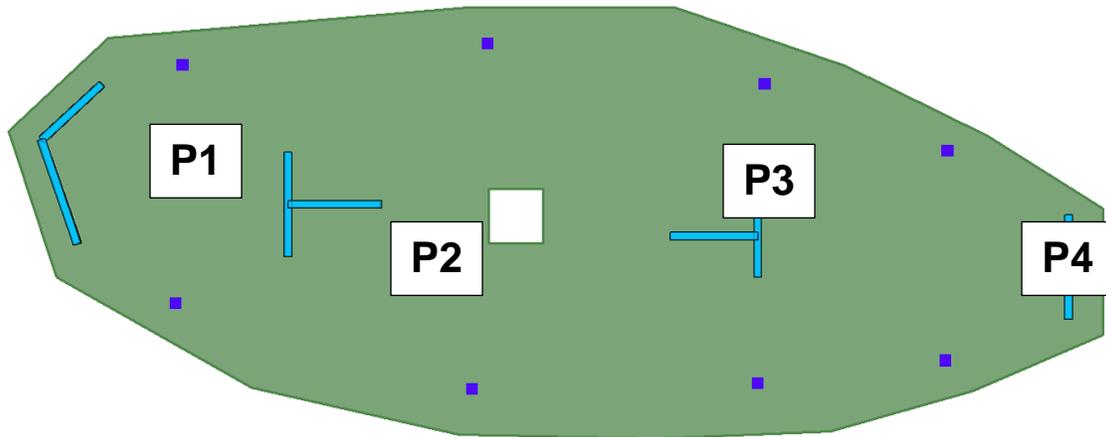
Wall Piers in a Two-Way Slab Frame
